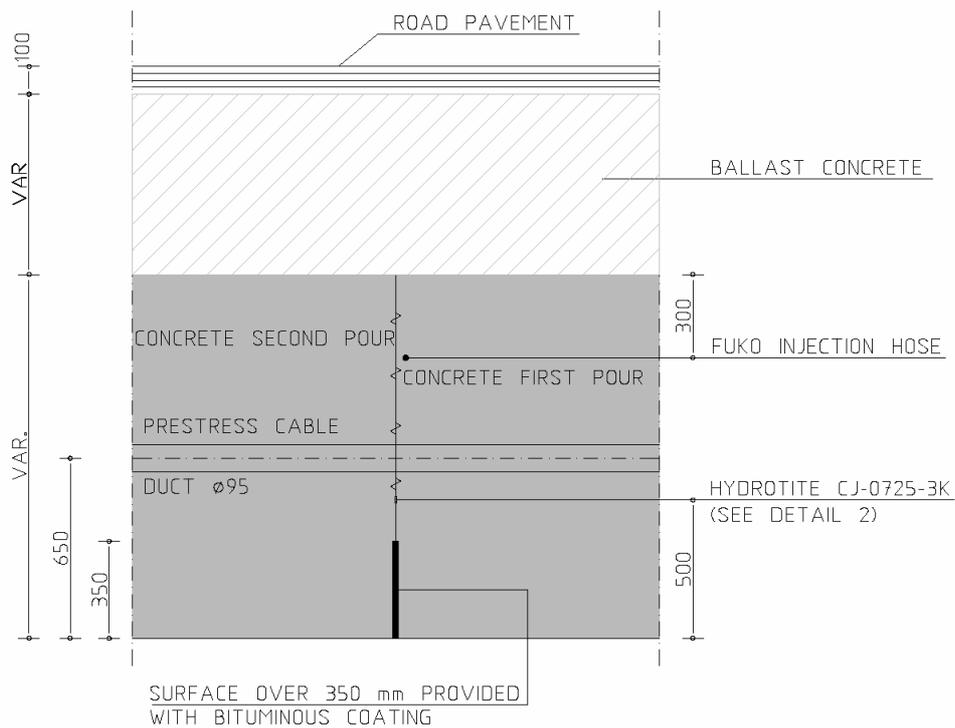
segment joint with crack inducer (bituminous coating) and injection hose
